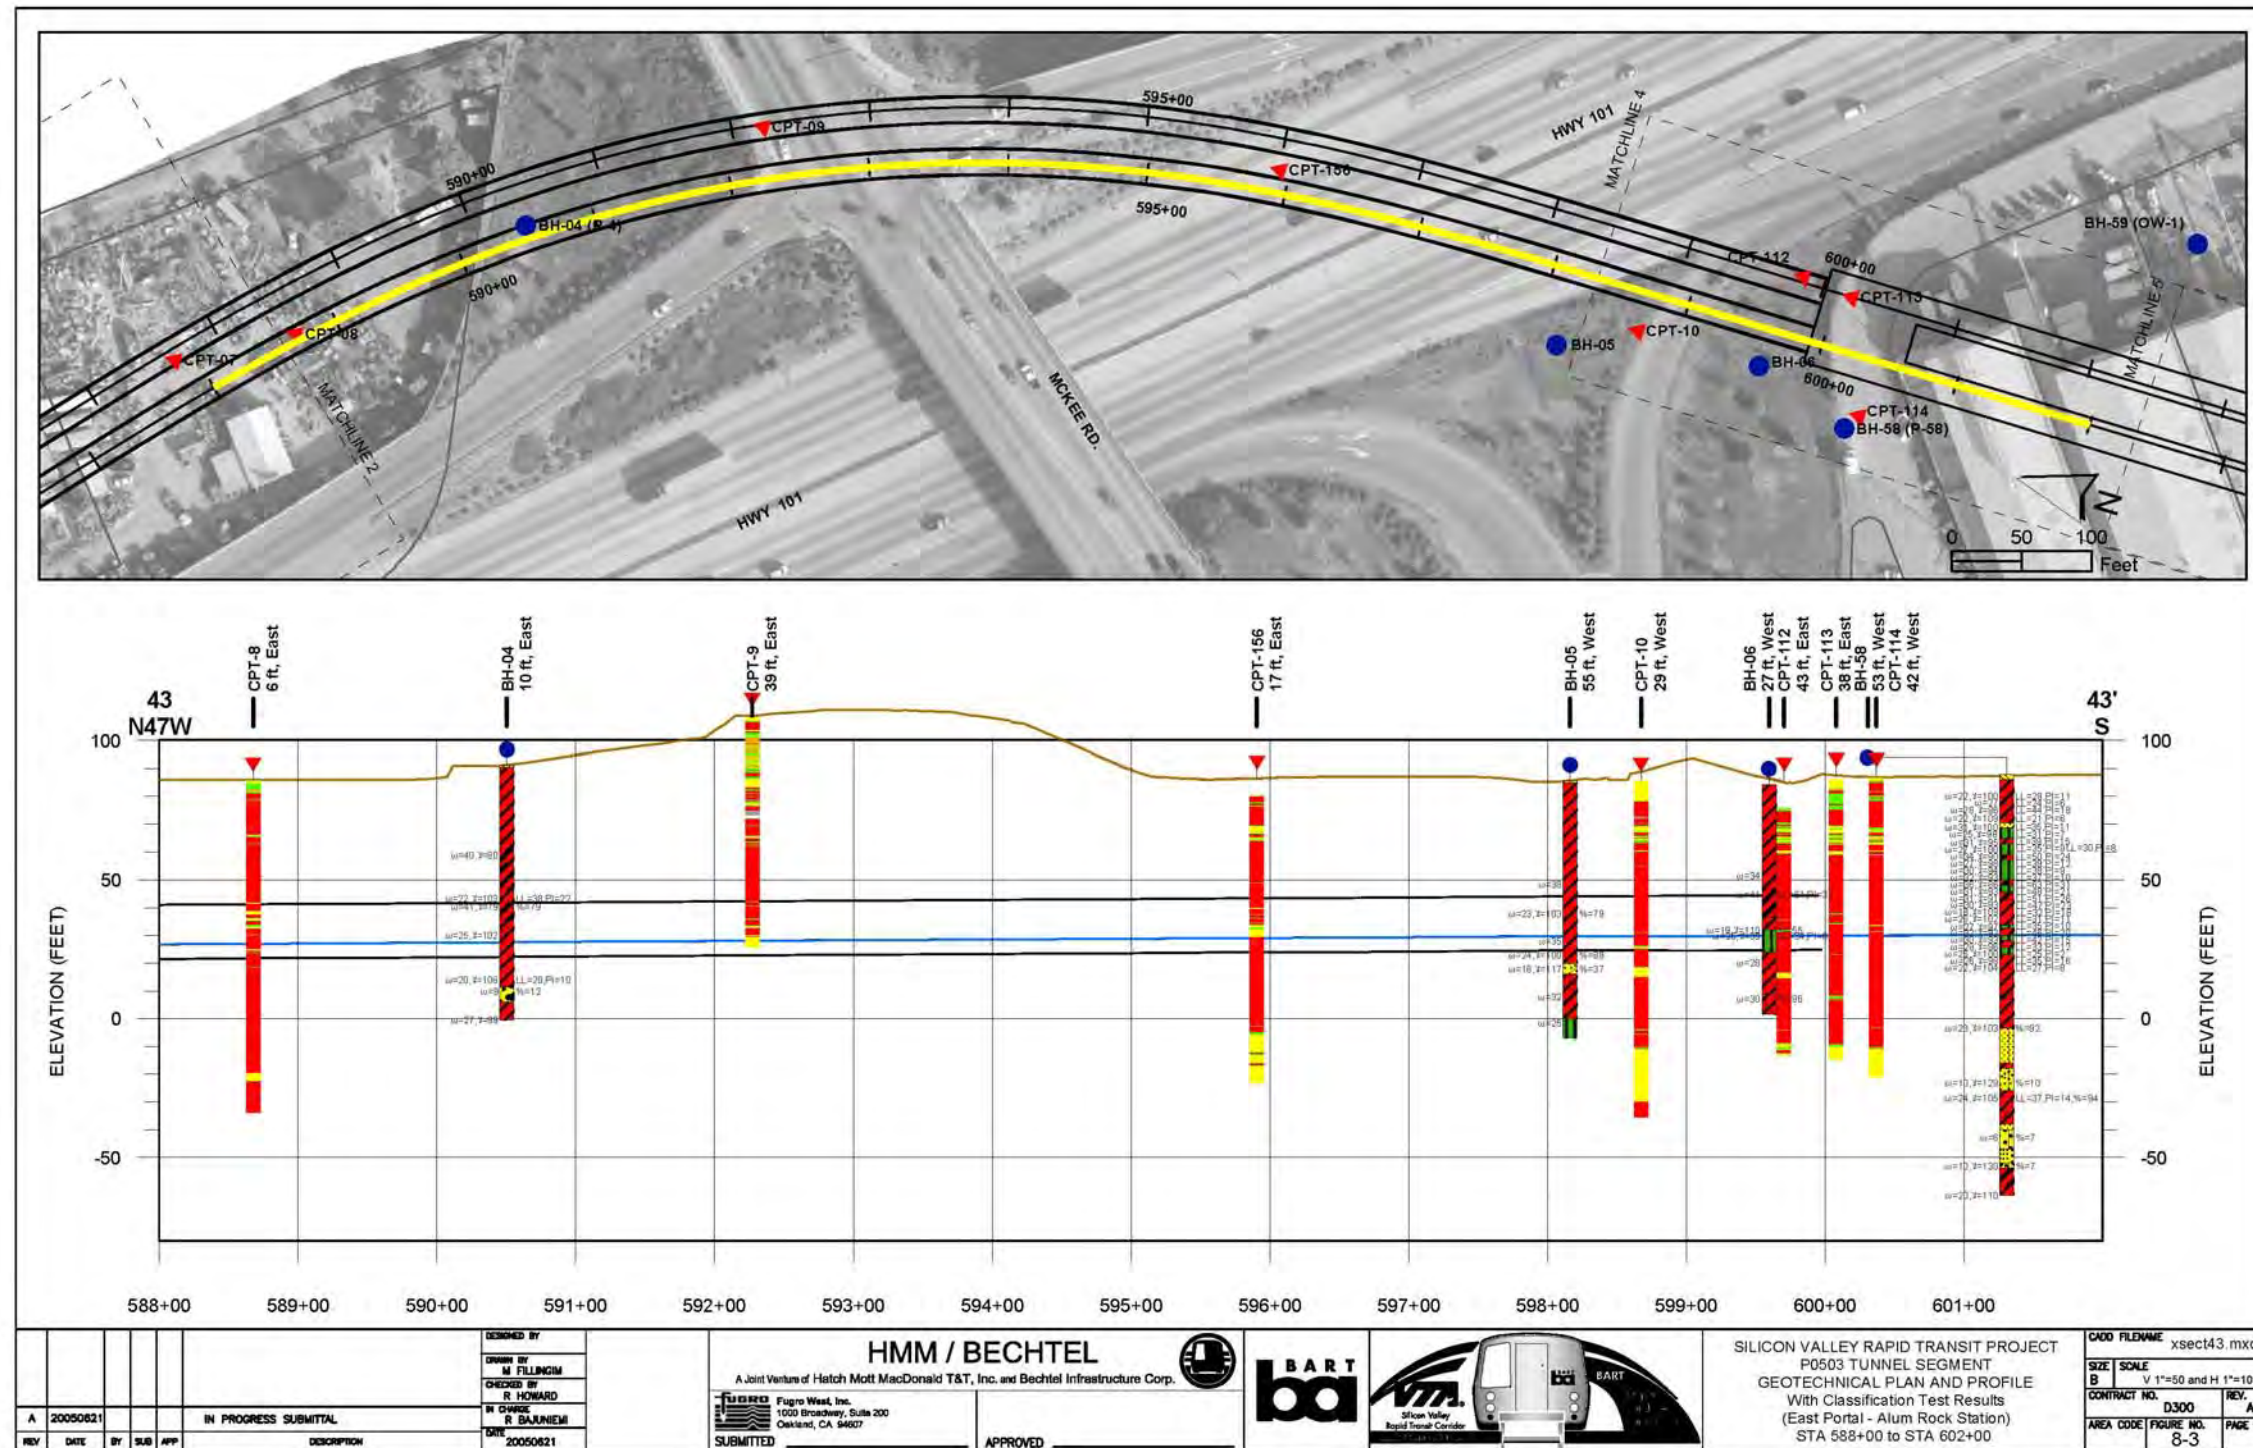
Geotechnical Plan and Profile with Classification Test Results: Station 588+00 to 602+00.
